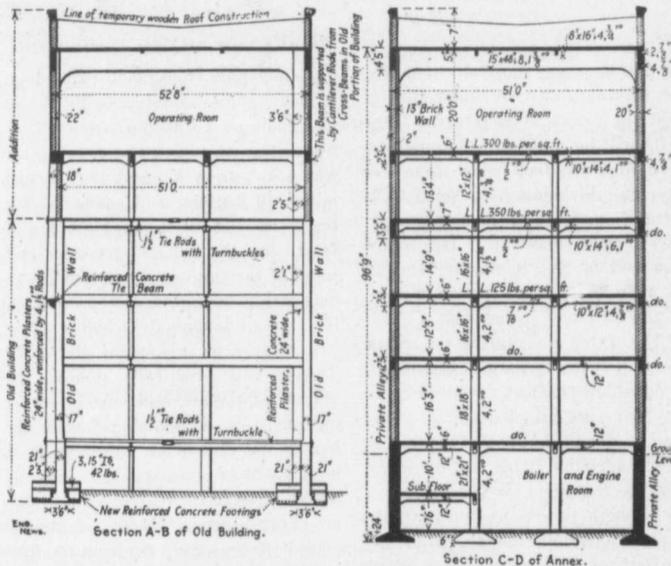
VERTICAL SECTION THROUGH OLD BUILDING AND THROUGH ANNEX.
